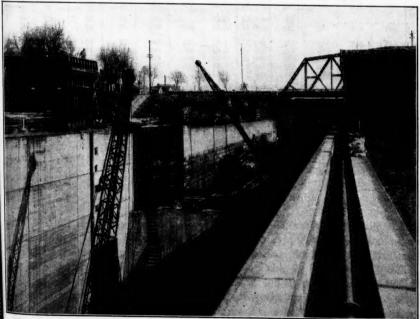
View of Chamber Wall Just After Removing Forms, Auxiliary Lock 41, Louisville, Ky.
